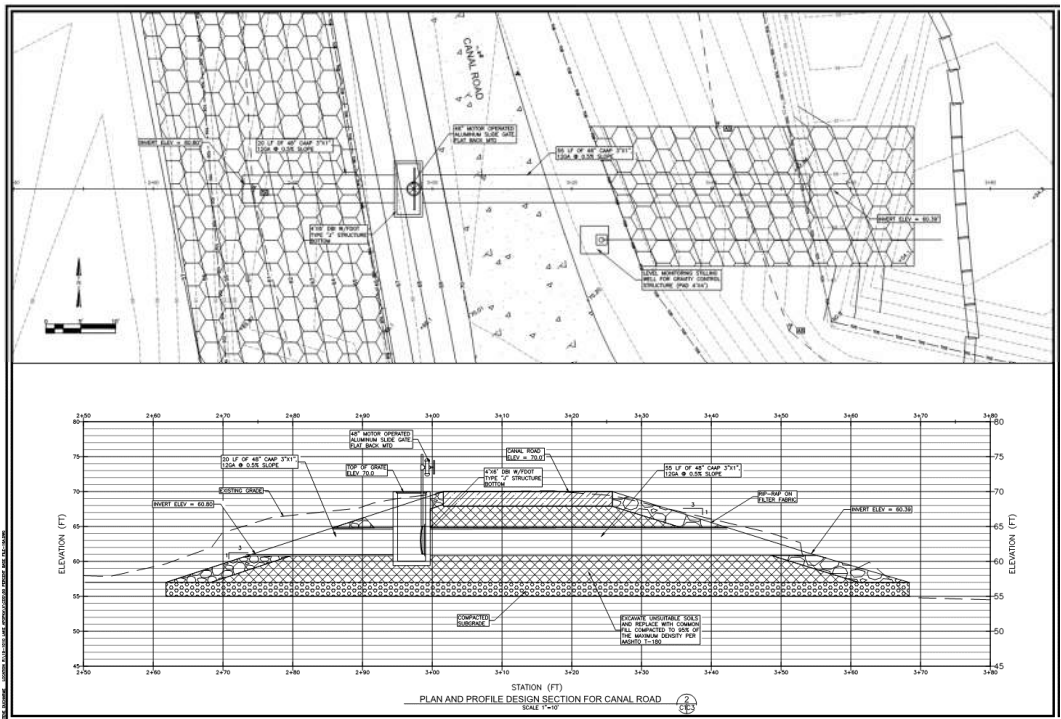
Proposed Plan & Profile Design Section – East Berm
